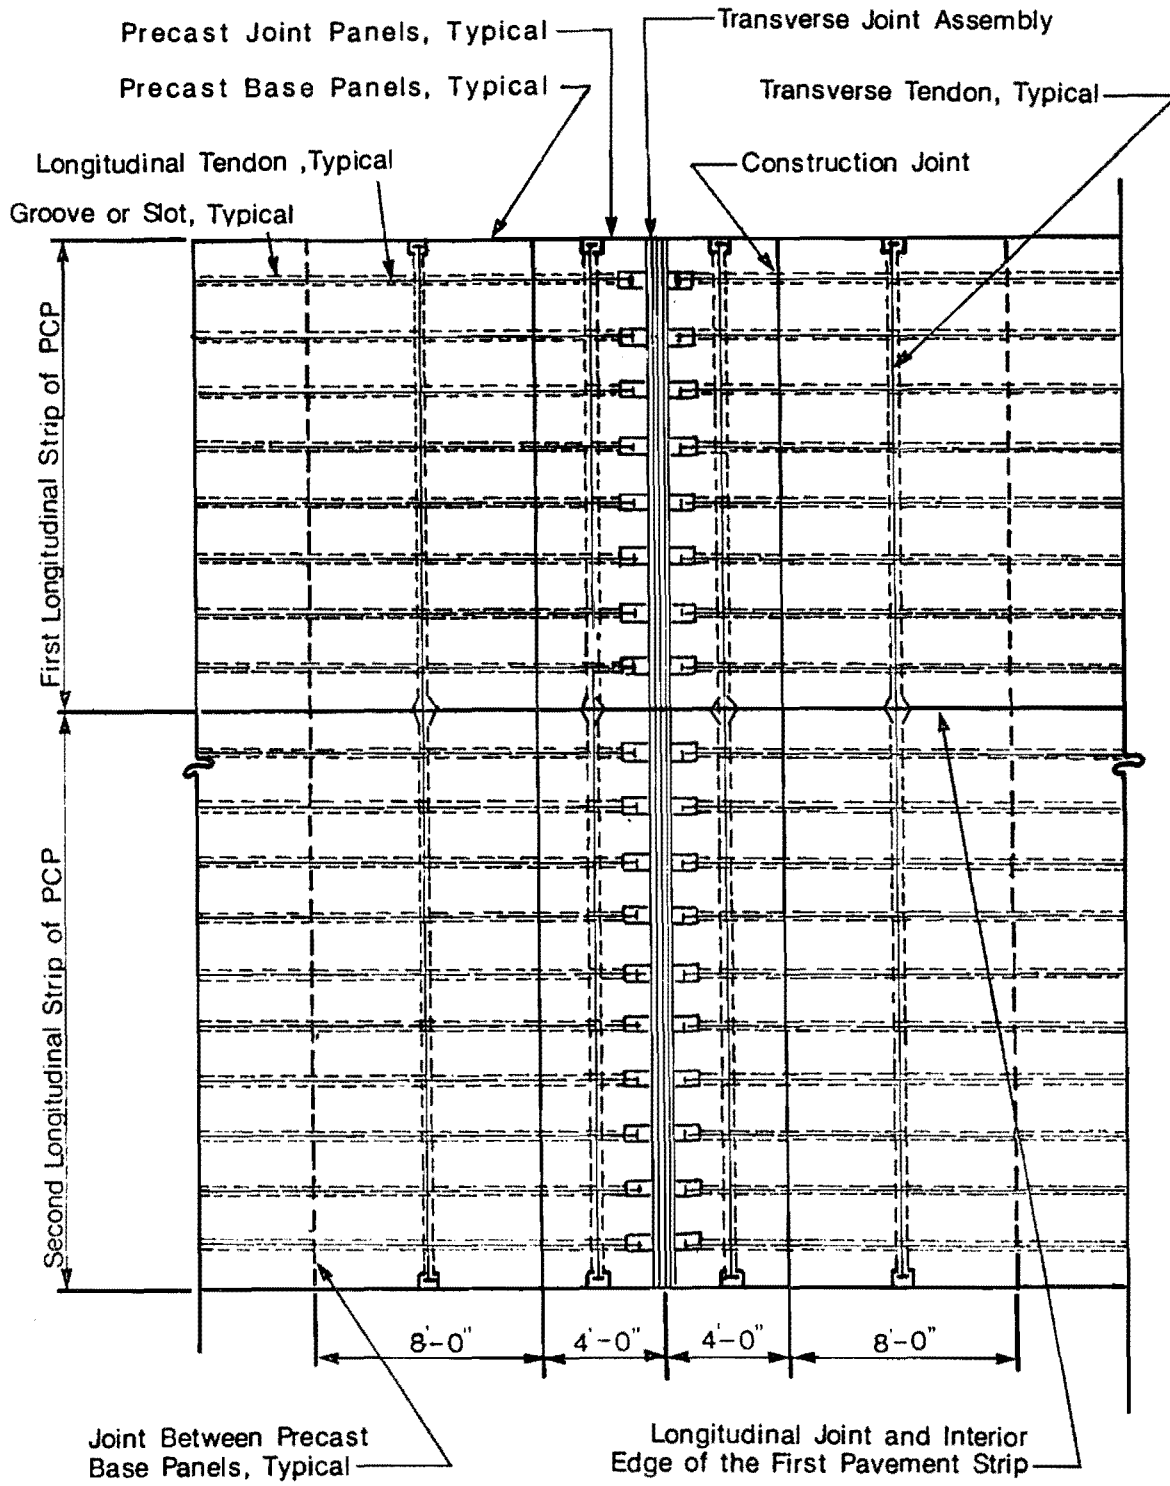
Composite prestressed concrete pavement type II (CPCPII).
